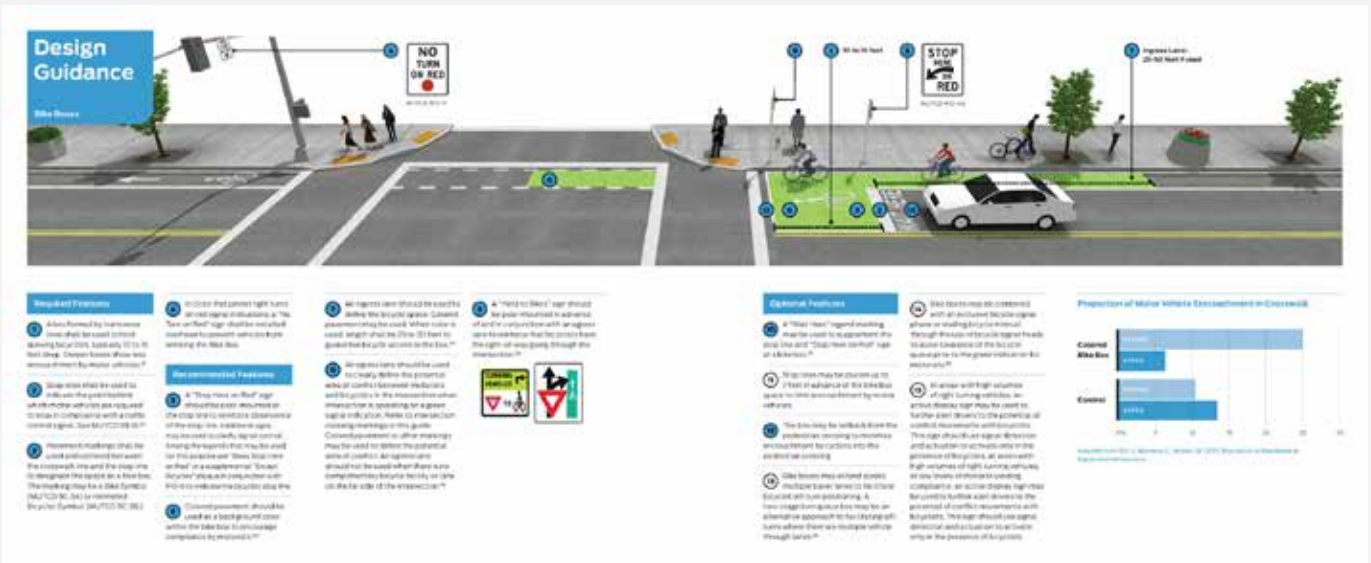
Bike Box Design Guidance. The NACTO Urban Bikeway Design Guide provides detailed recommendations for designing bike boxes at intersections. Image source: NACTO.
